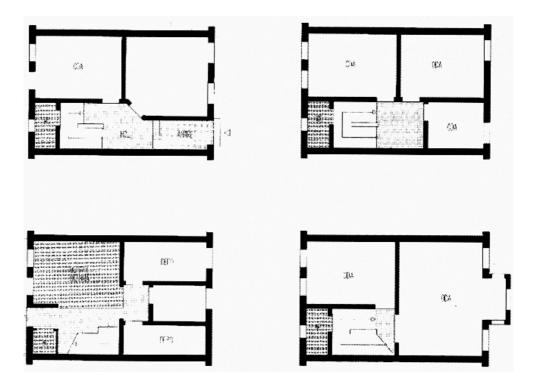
Surp Agop row-houses in İstanbul, typical floor plans
